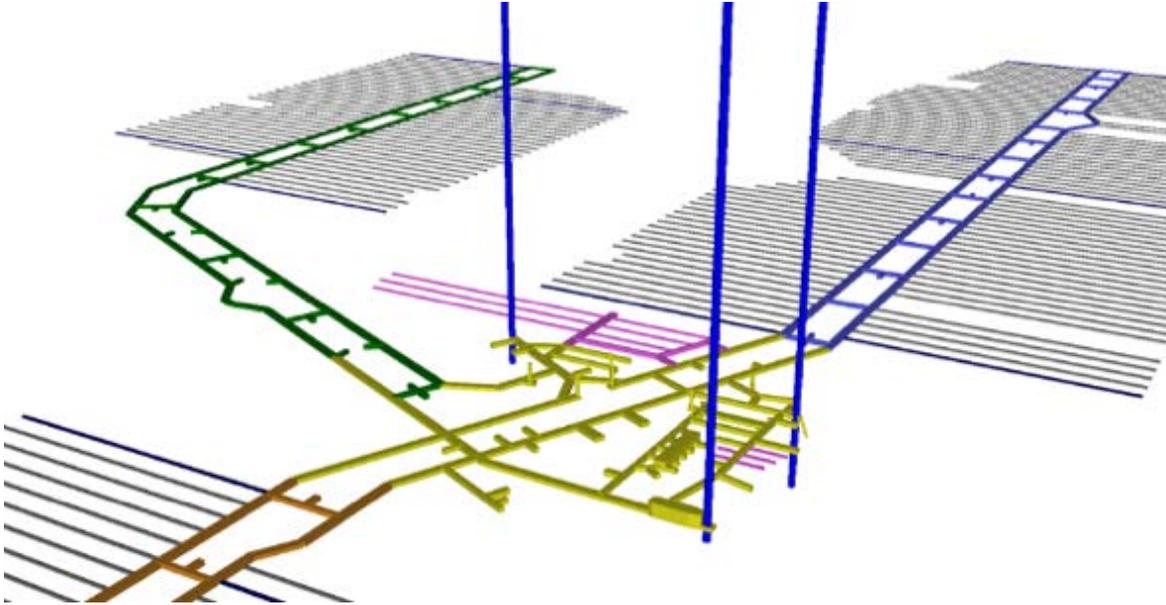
Illustration of centralized service area of repository showing the underground demonstration areas (highlighted in purple). (For illustration purposes only; does not reflect site specific layout for Revell Site).
